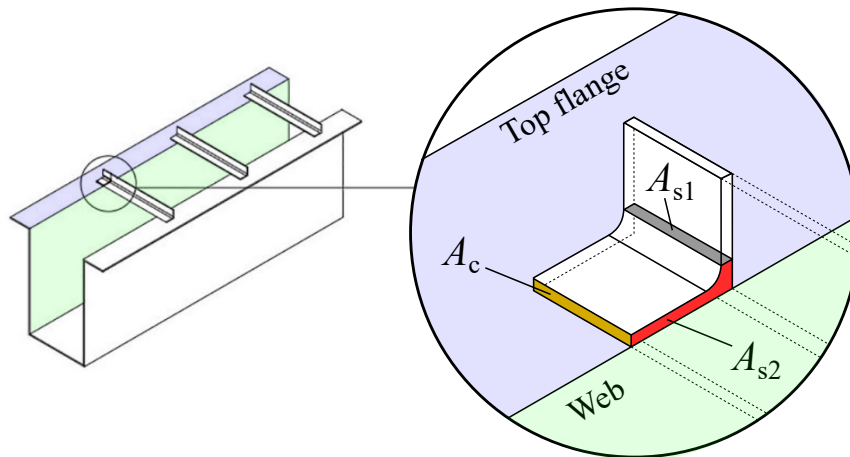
Shear failure plans and concrete local pressure zone (Lepourry et al., 2018)
